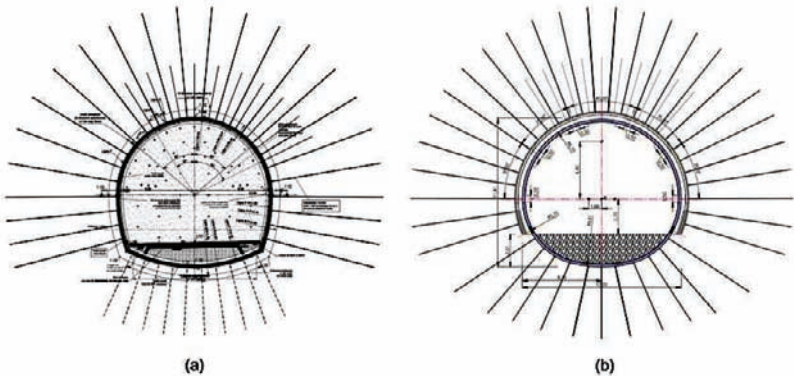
Tunnel cross section showing the excavation-support systems adopted in the Saint Martin La Porte access adit between chainage 1267 and 1324 m (P7.3, a) and chainage 1325 and 1700 m (DSM, b). After Barla *et al.* (2008).
